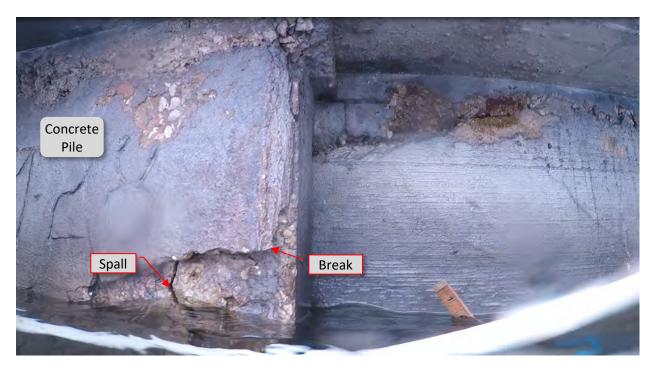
P24. STA 4+36. Break/spall at east flange at pile. Loss of concrete. Honeycomb area.
